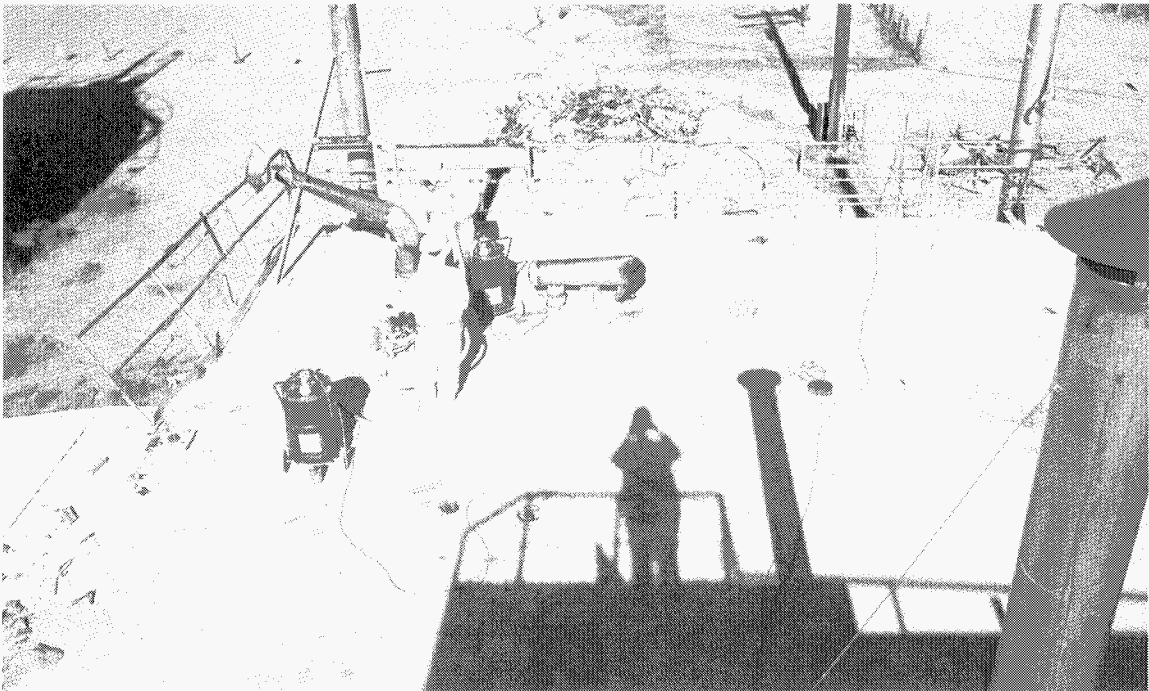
Railroad Trench Grouting, Facing East, 04/20/2005
